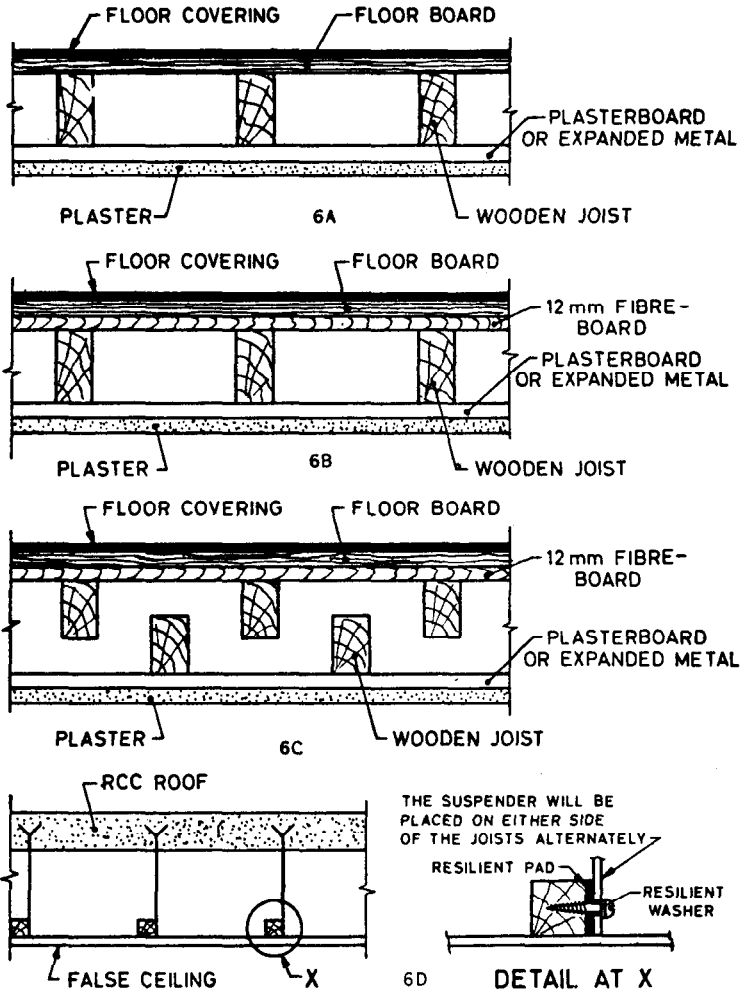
TIMBER FLOORS, FLOATING CONSTRUCTION, WITH SUSPENDED CEILING
